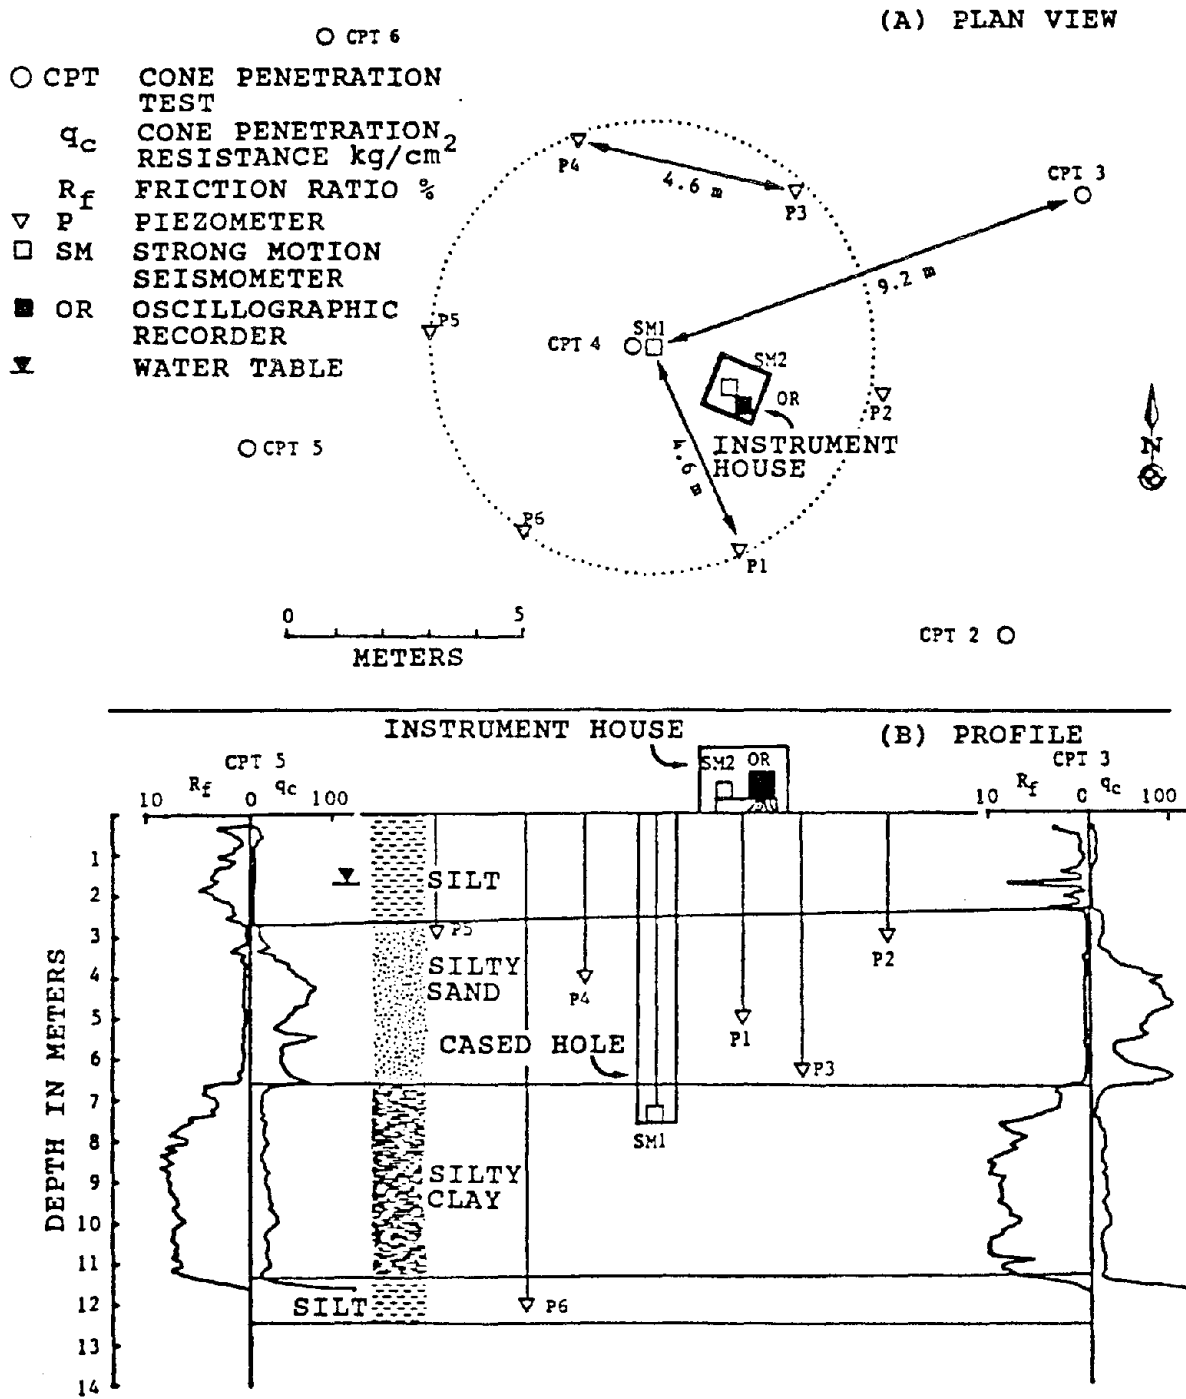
Plan and cross section of Wildlife site showing locations of accelerometers and piezometers. (After Youd and Wieczorek, 1984)
